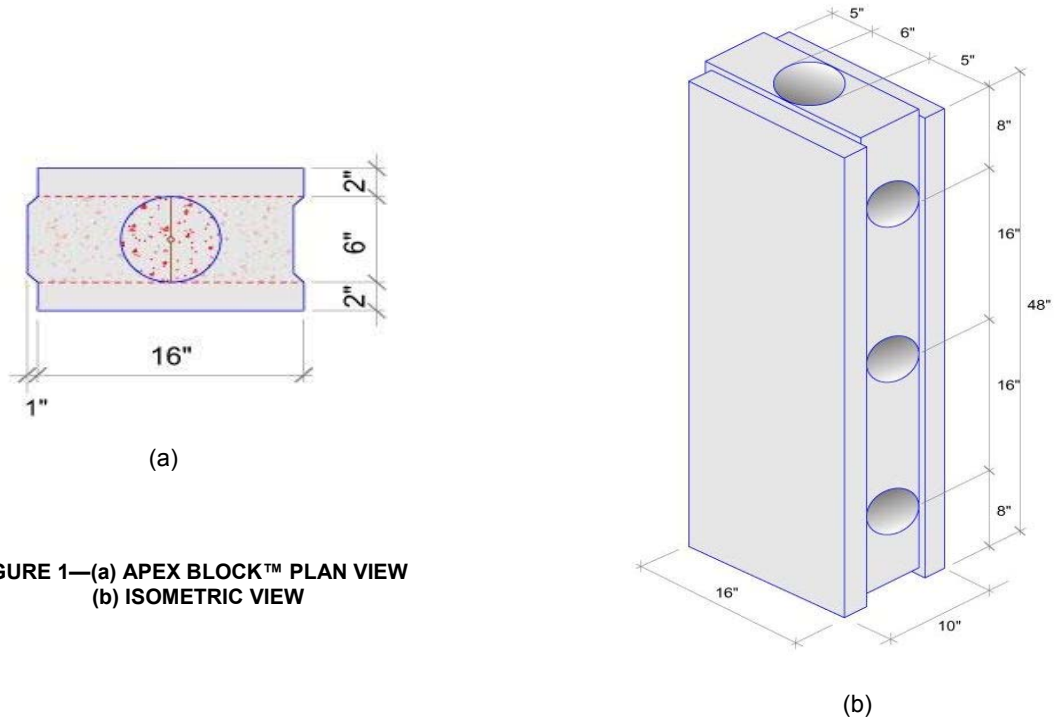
(a) APEX BLOCK™ PLAN VIEW
